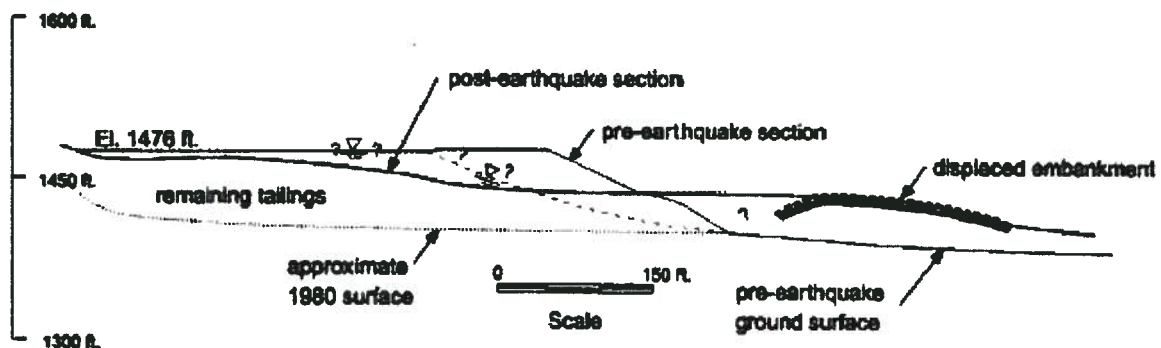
A section of the failed tailings dam (Harder & Stewart, 1996).
